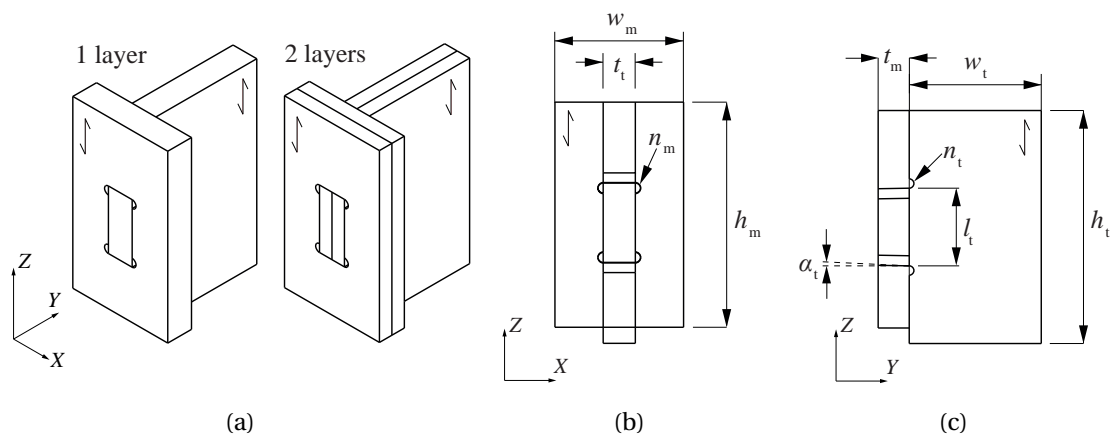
Shear test specimens: (a) Axonometries of single- and double-layered TT specimens (b) Front view (c) Side view.
